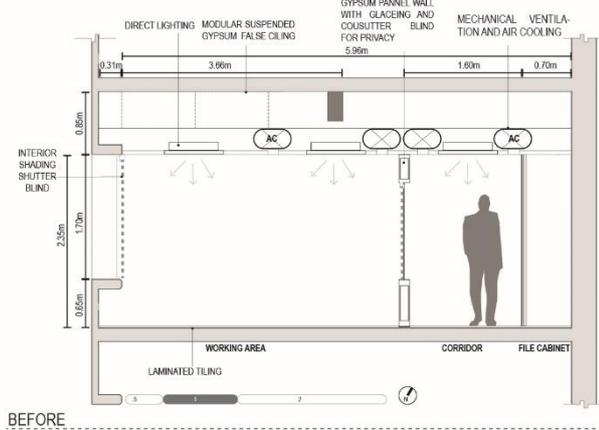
Typical section of studied floor - general construction details before the refurbishment.
